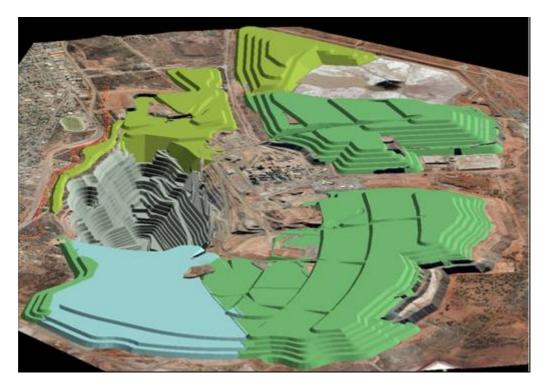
Proposed Waste Rock Dump and Open Final Pit Landform
